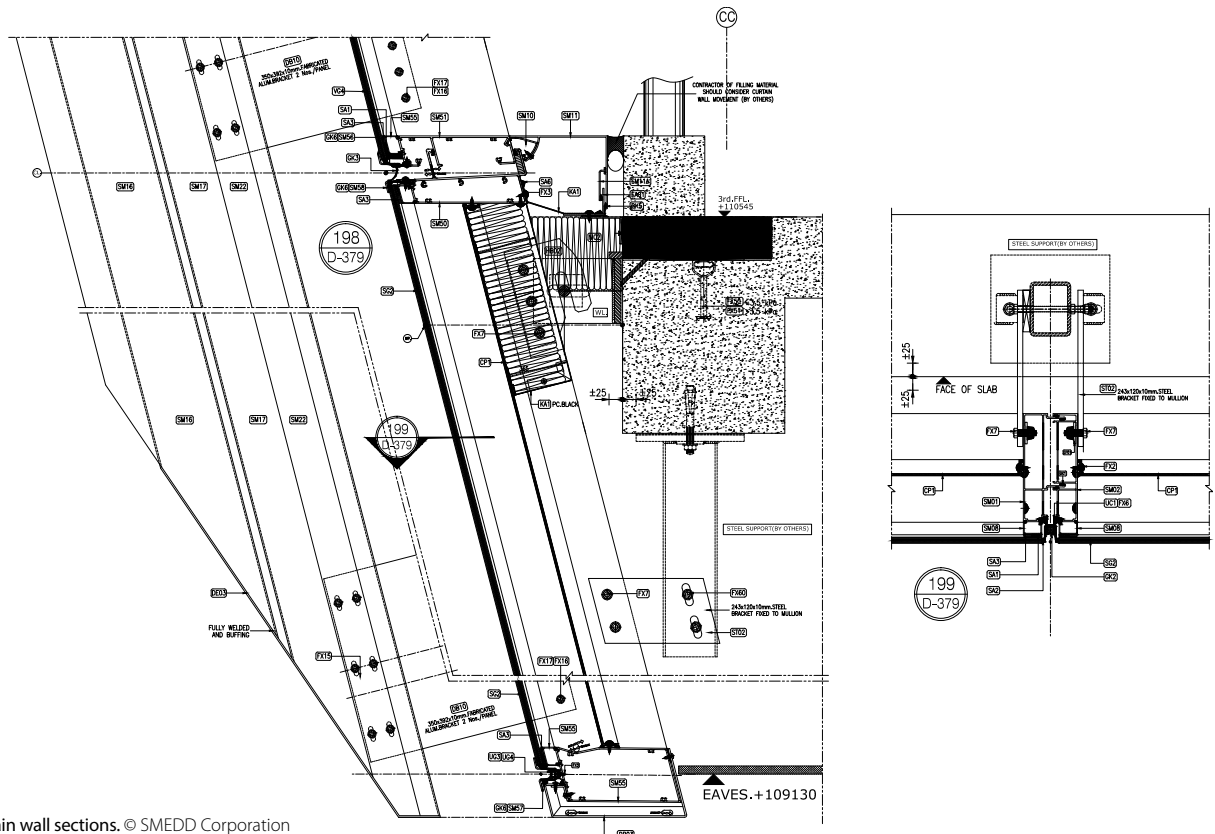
Curtain wall sections. © SMEDD Corporation
